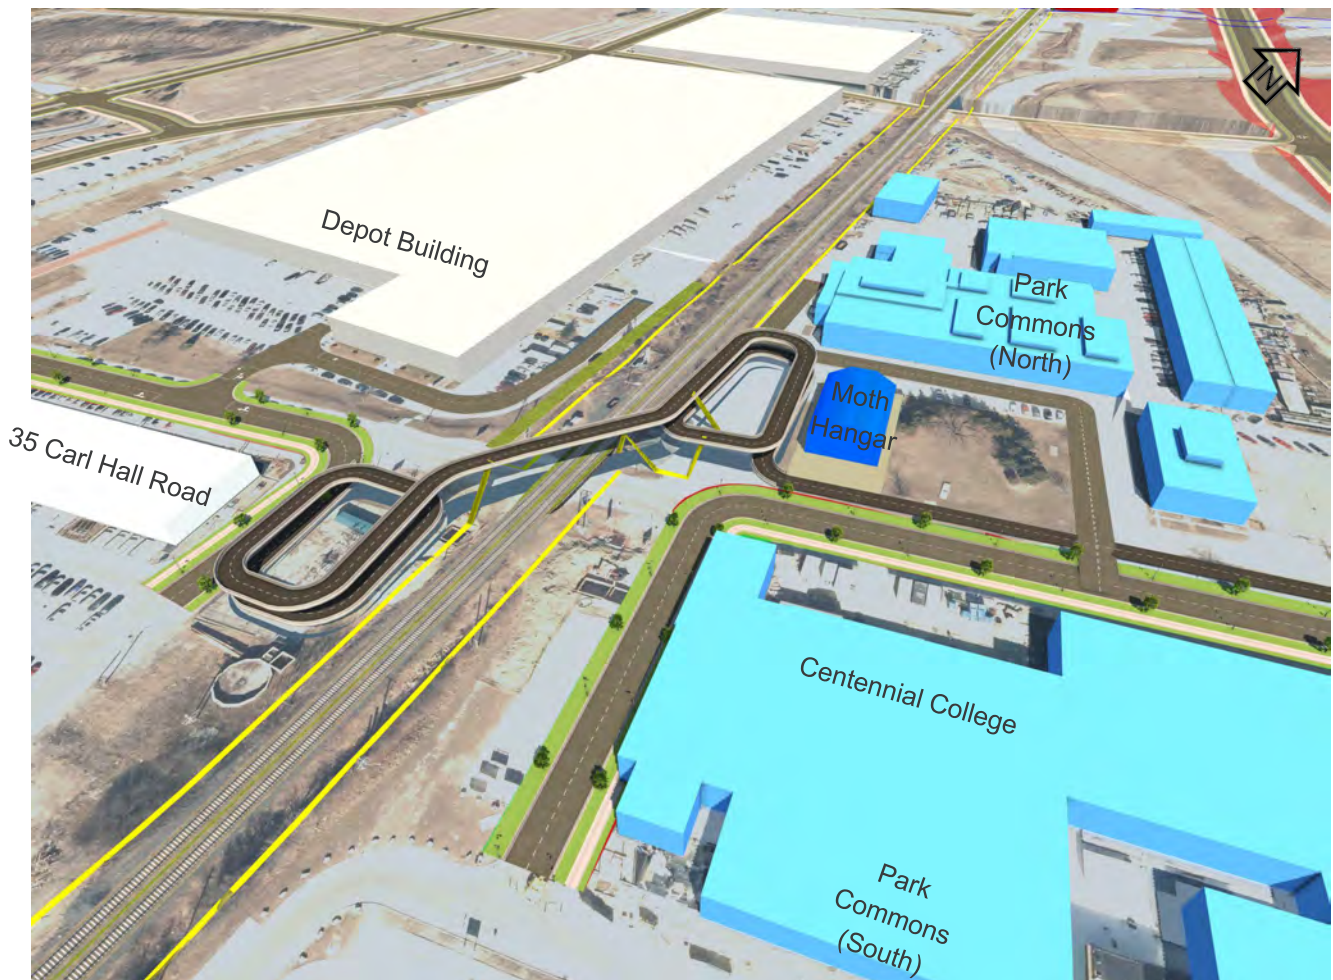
Option 6 Active Overpass, Vehicle Connection Closed (Looking Northwest)
